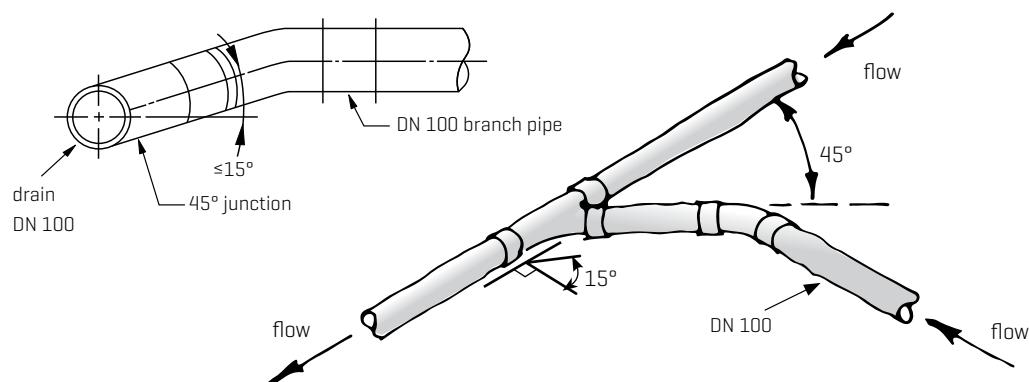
100 mm branch pipe to 100 mm pipe on grade.
